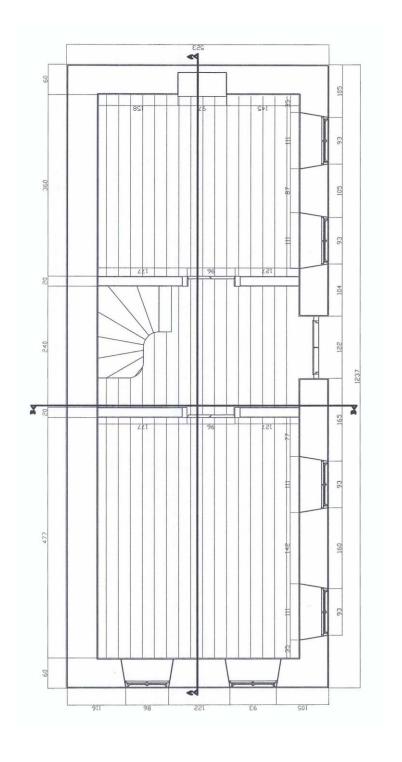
First Floor Plan of 19-Hamam Street Scale: 1/75
